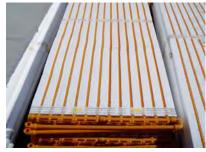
Heating pipes are inserted in XPS boards, which are mounted on the existing wall.
